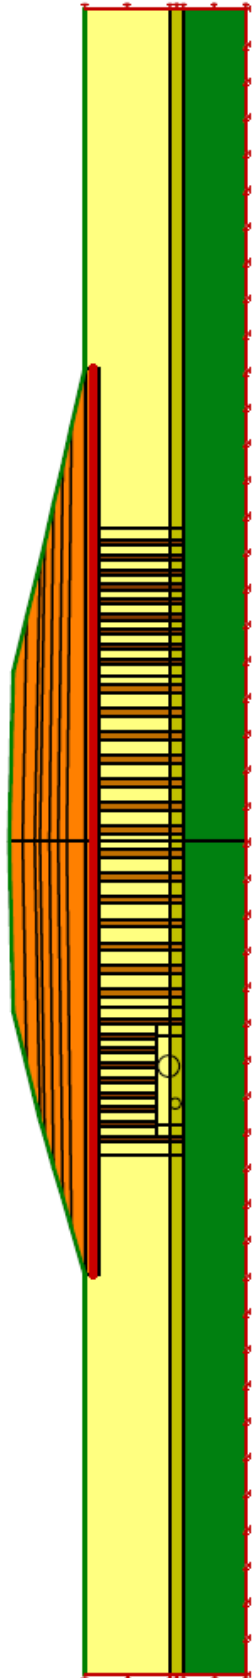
FEM South Abutment Cross-Section Model with Horizontal Boundary Conditions
